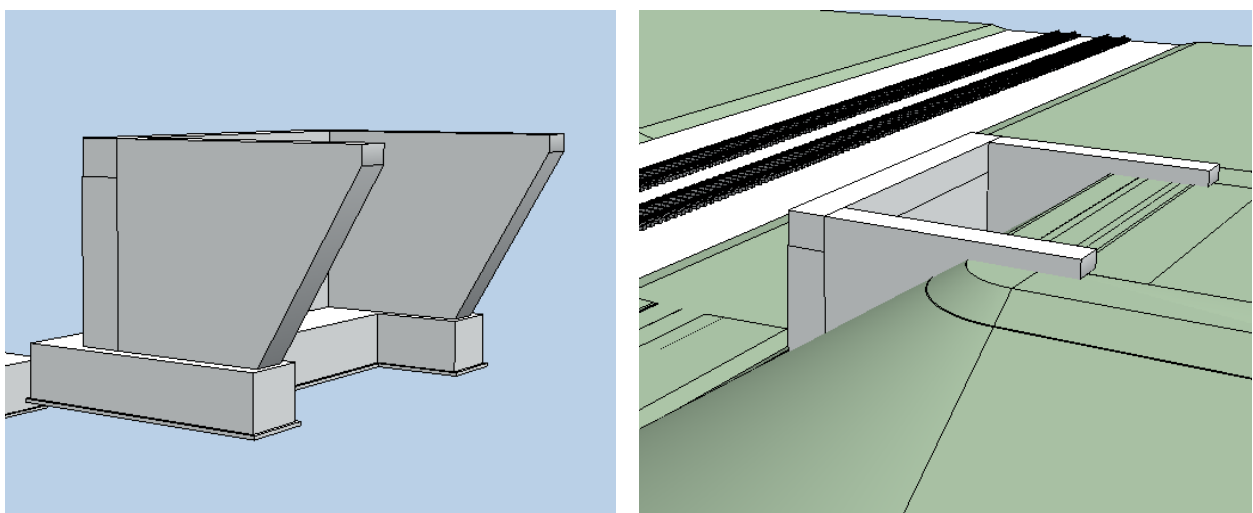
perpendicular wing walls for road overpass, basic model (left) integrated in landscape but without backfill (right)
